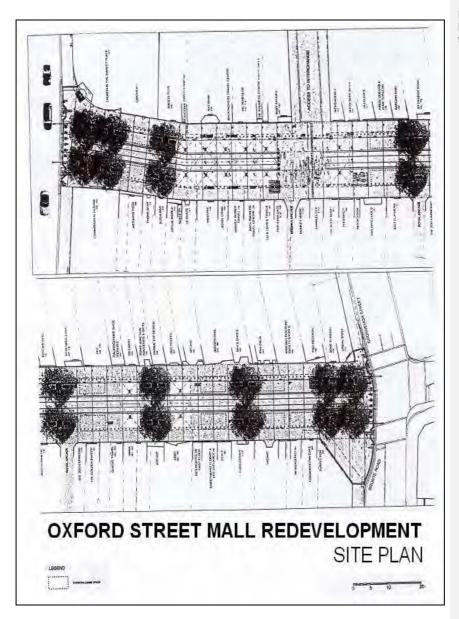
Oxford Street Mall, Bondi Junction (Site Plan with trees and market canopies).
